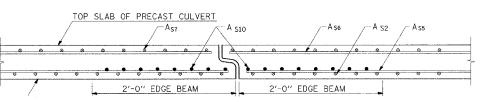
DETAIL OF PRECAST CONCRETE BOX CULVERT SECTION
